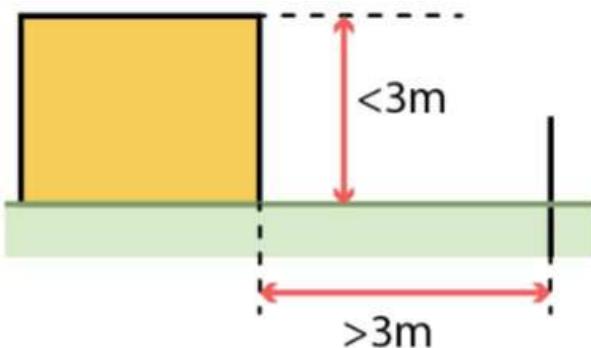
Proposed maximum height of a garden building or pergola without a dual pitched roof
